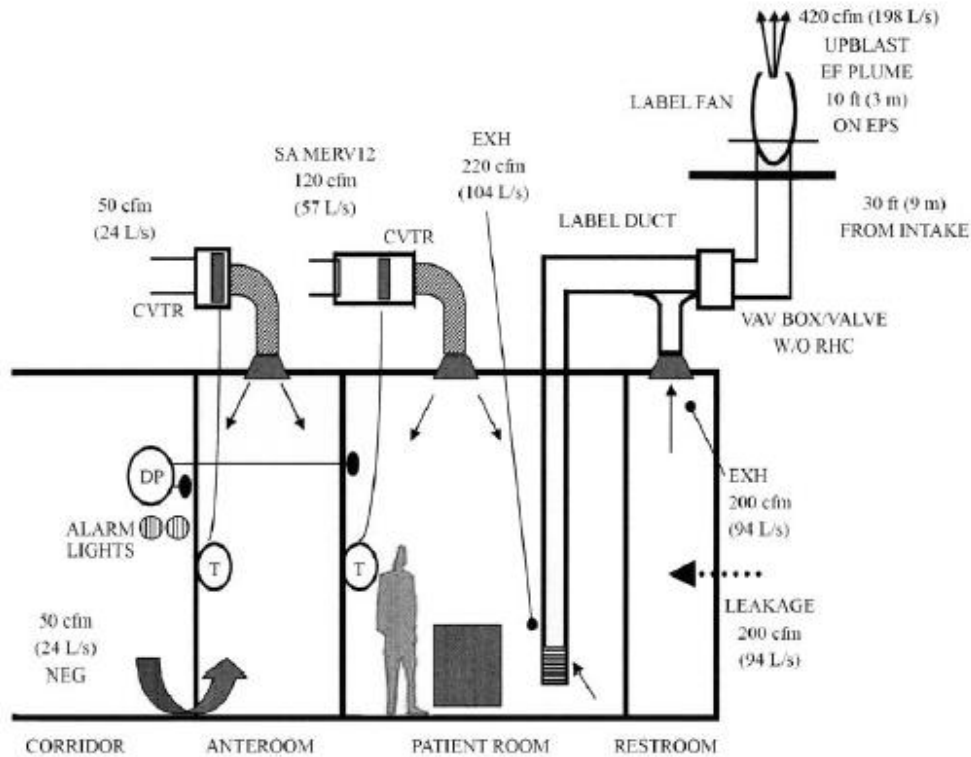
Airborne Infection Isolation (AII) Room Arrangement
